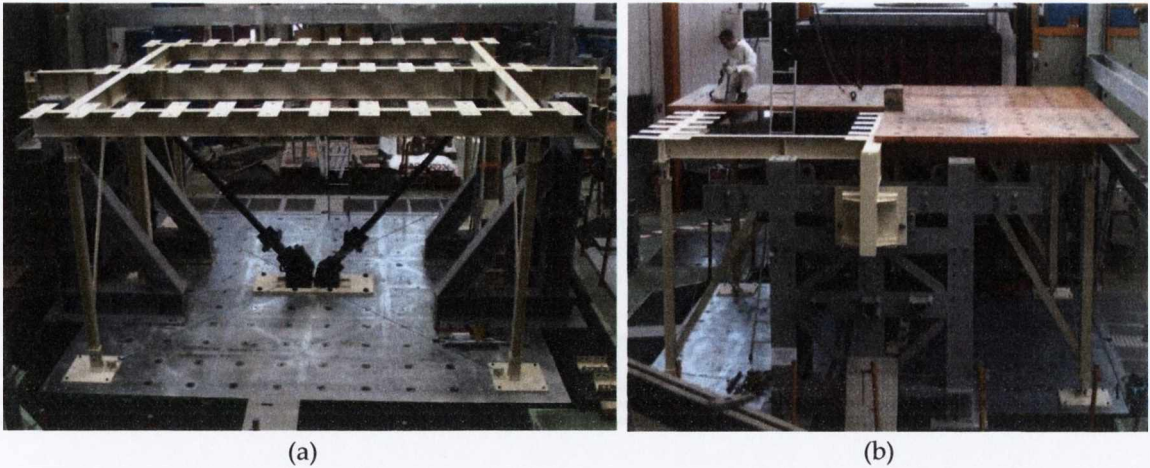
BRACED test frame (a) side elevation with no plate or concrete masses in place and (b) end elevation with three plate masses secured to frame.
